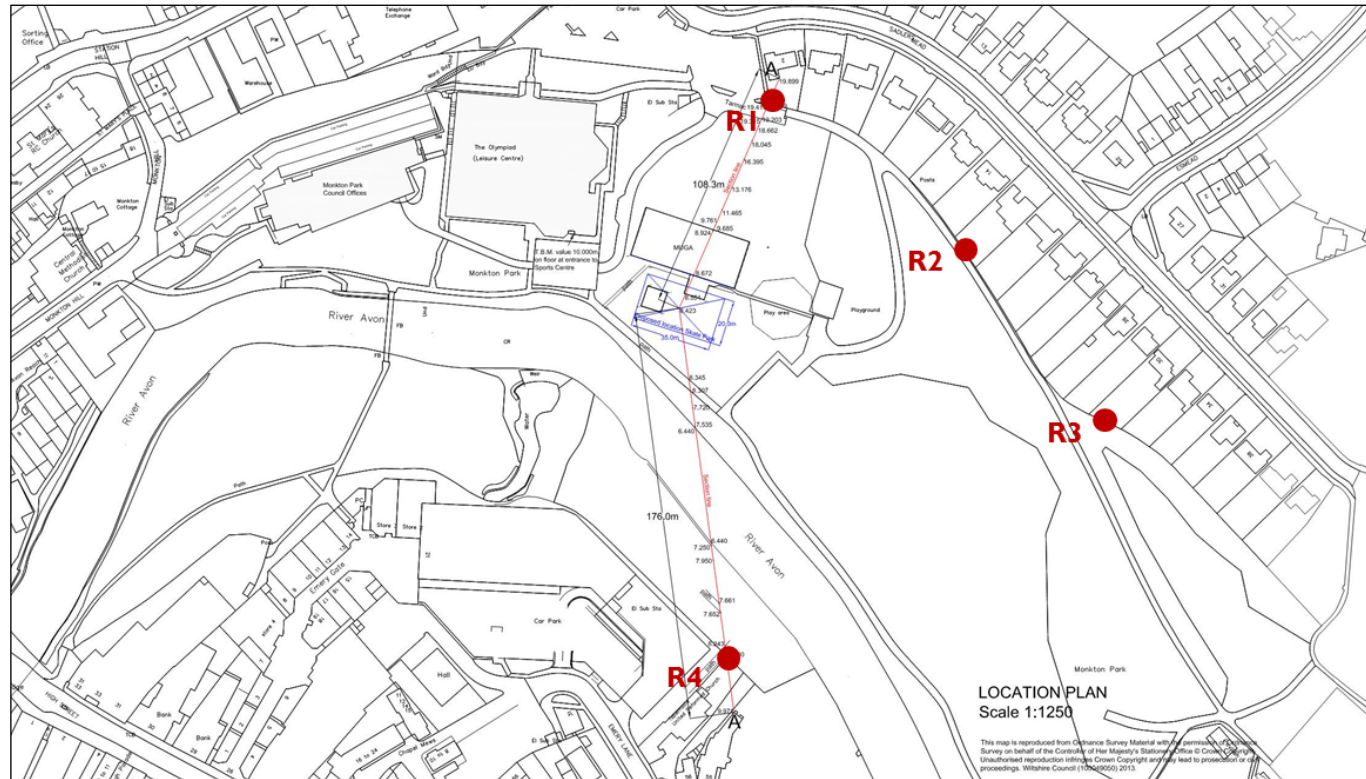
(A) –SITE PLAN INCLUDING TRANSECTION THROUGH THE SITE
